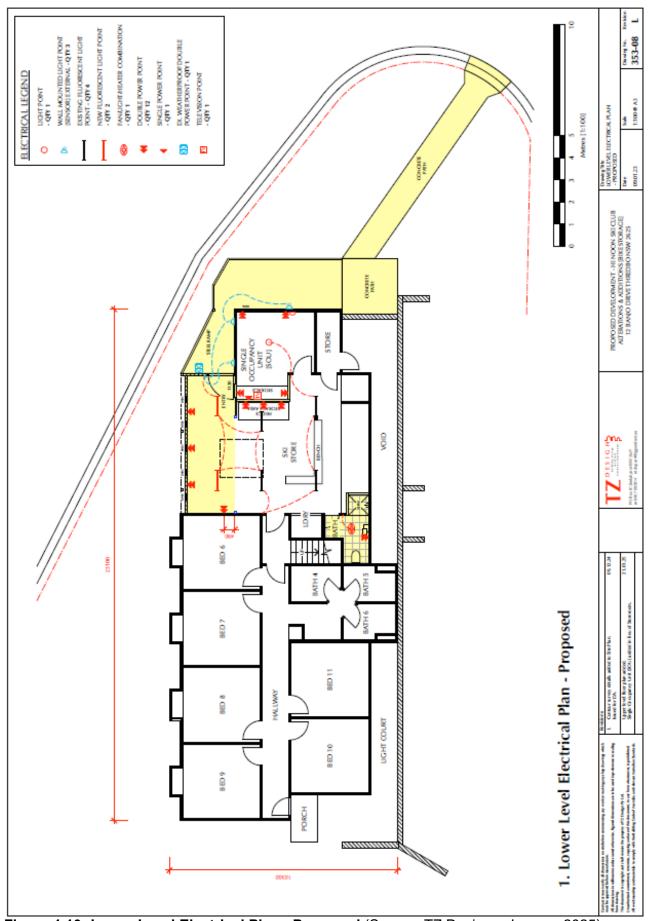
Lower Level Electrical Plan - Proposed (Source: TZ Designs, January 2025)
